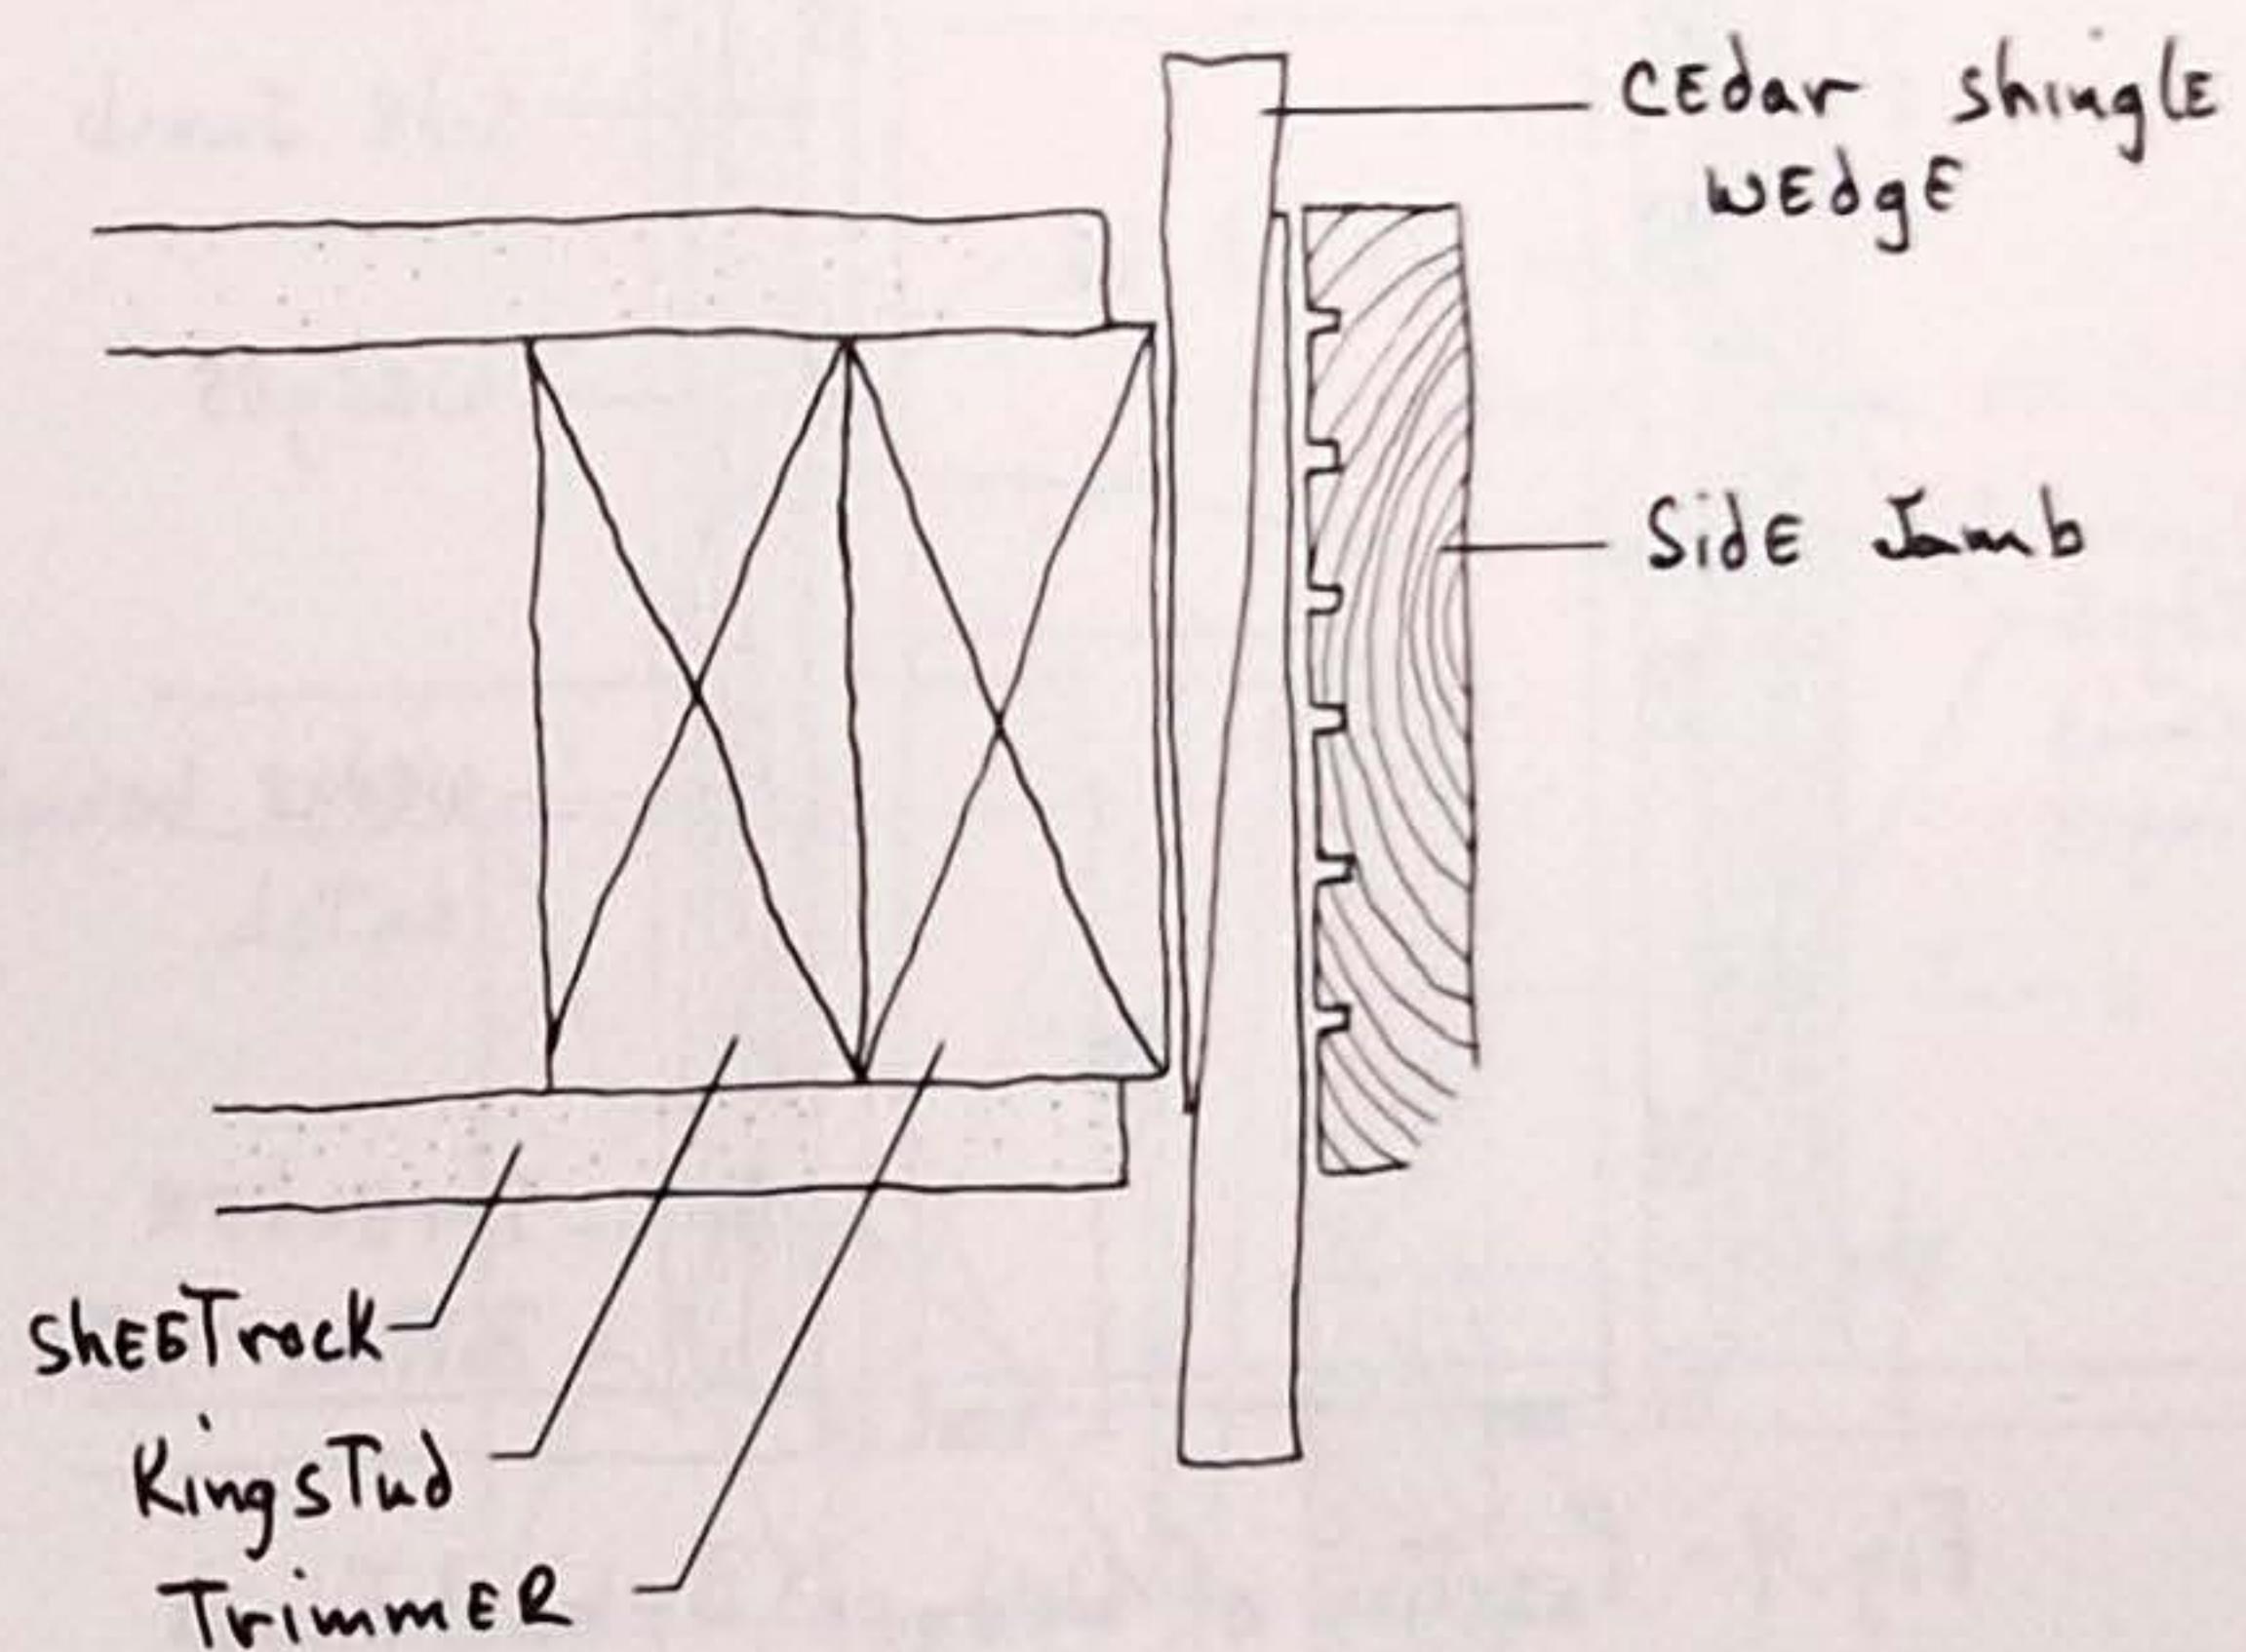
Wall section, Wedges & Side Jamb (Top View)
